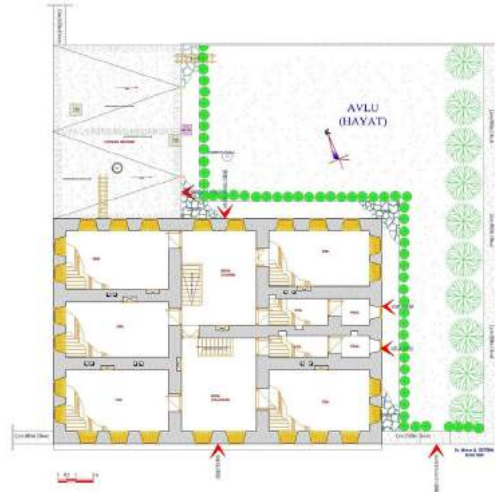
Polat Yörükoğlu House Upstairs Restitution Plan, drawn by author.
